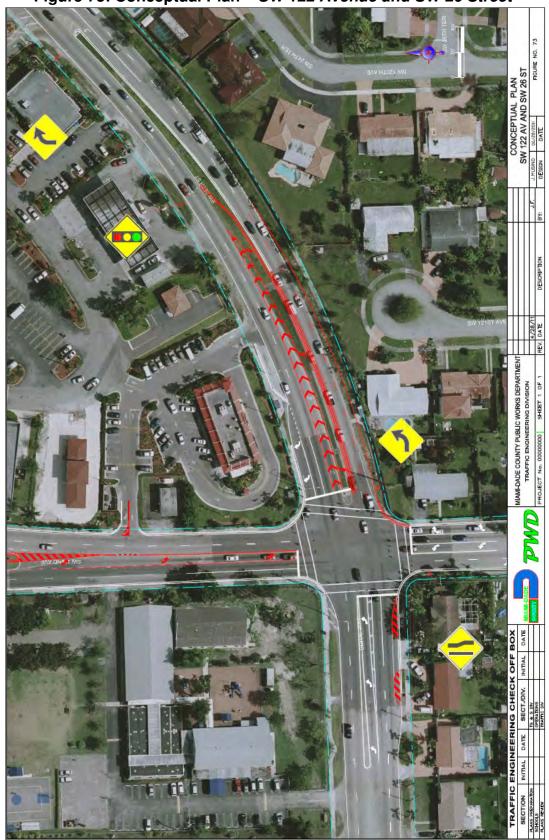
Conceptual Plan – SW 122 Avenue and SW 26 Street
